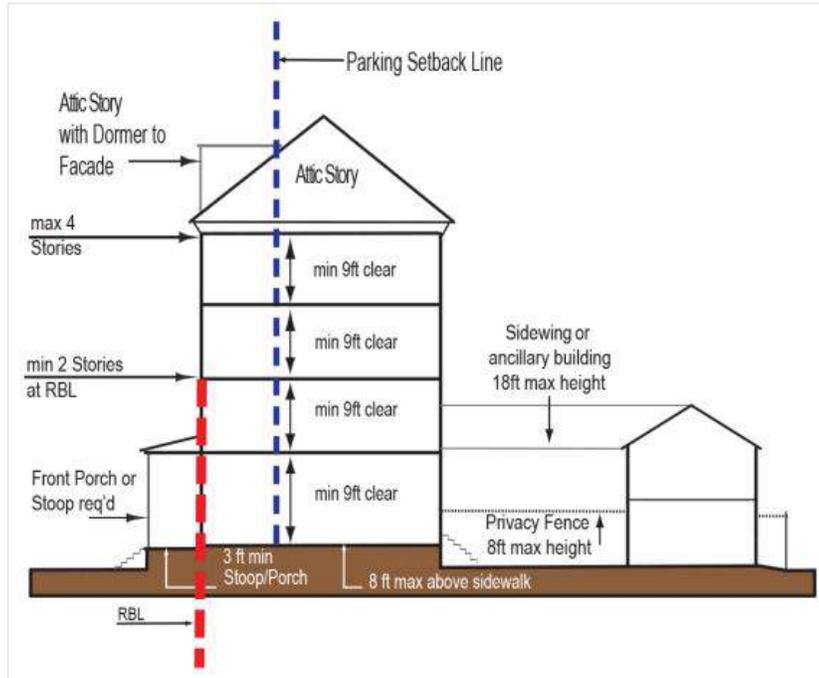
Townhouse/Small Apartment Height Standards
